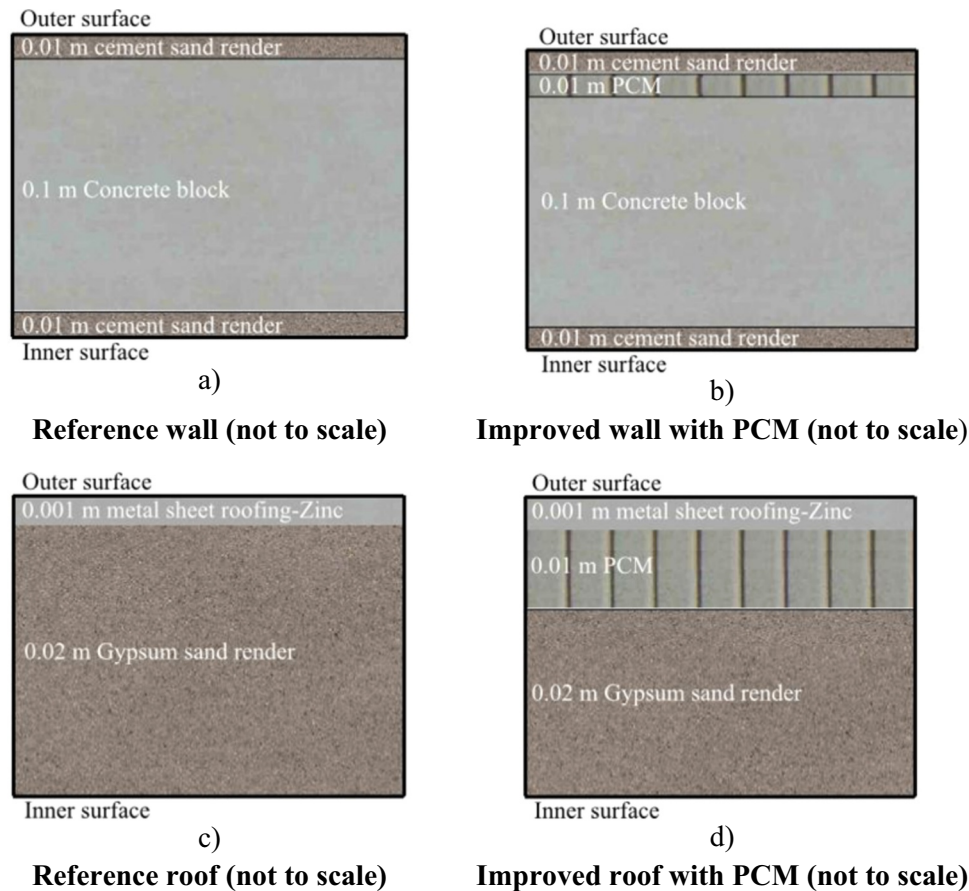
Construction configuration for reference case and the improved case with the PCM a) Reference wall, b) Improved wall with PCM, c) reference roof, d) improved roof with PCM.
